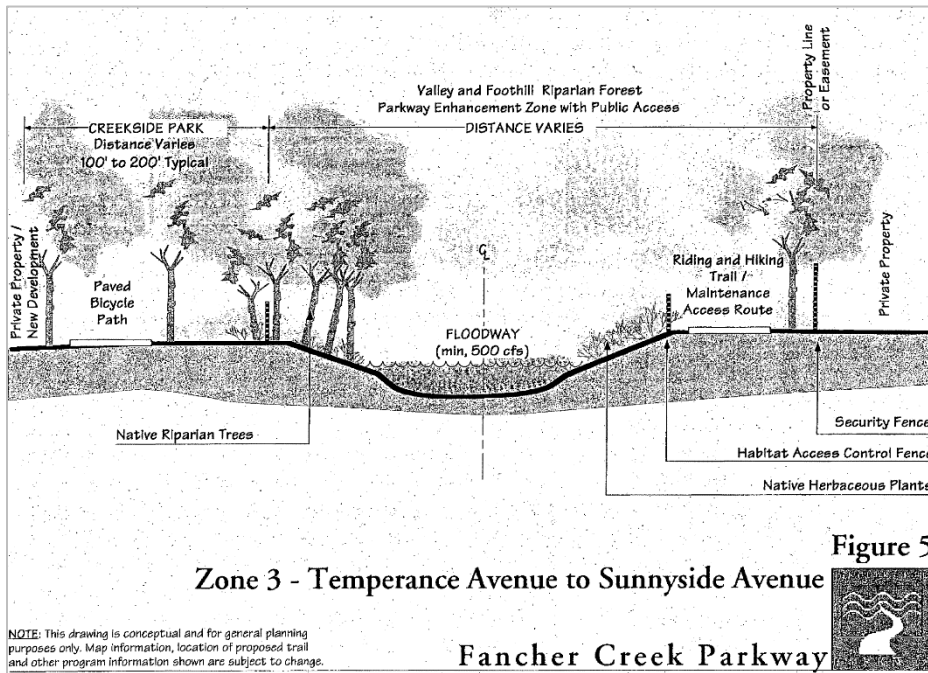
Fancher Creek Parkway Concept Plan: 2001 Fancher Creek Draft Concept Plan
